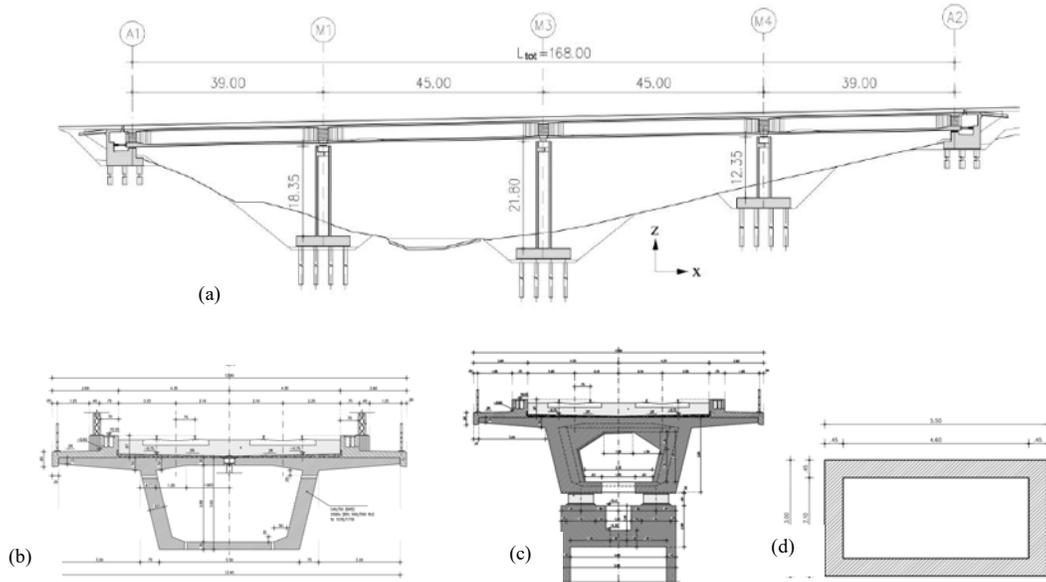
(a) Longitudinal section of the bridge (b) Typical Cross Section (span), (c) Cross section close to Pier (d) Pier Section
